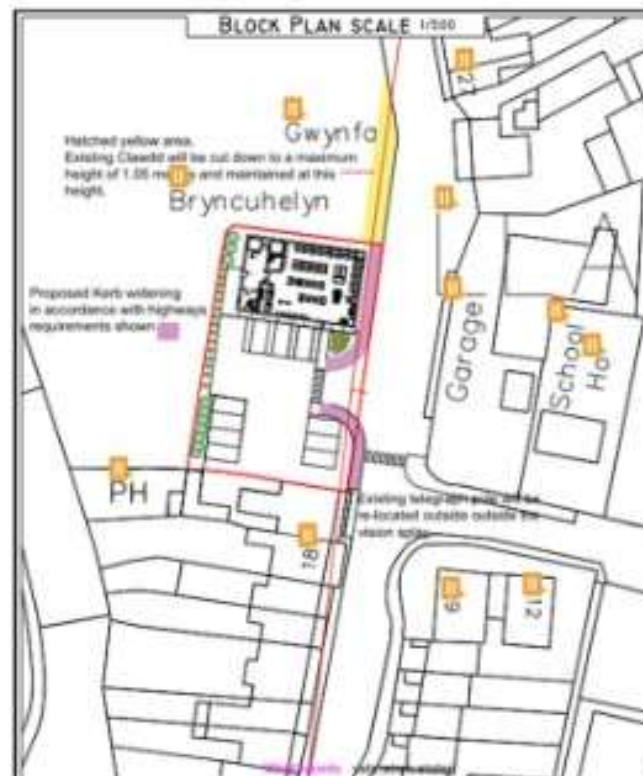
Proposed Development (Extracted from drawing 2275-A3-02 by Cynllun Plans Draw Architectural Services)
